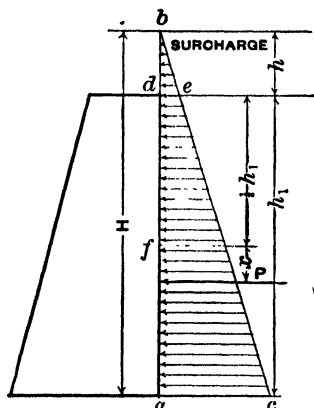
Earth Pressure on Vertical Back of Wall with Surcharge. (See p. 760.)
